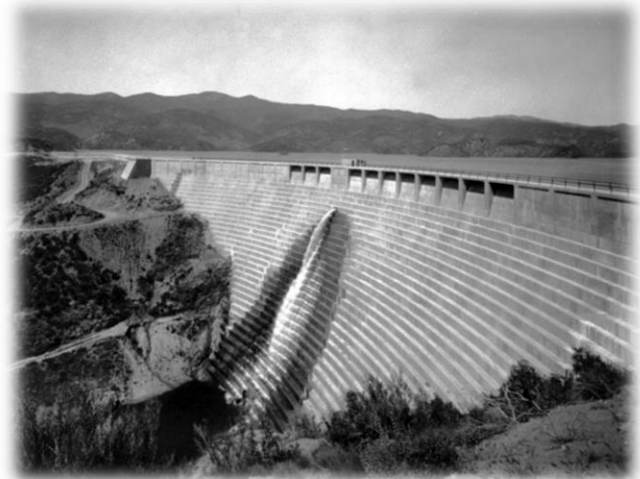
Photo of Saint Francis Dam after construction (SCVNews, 2018)
